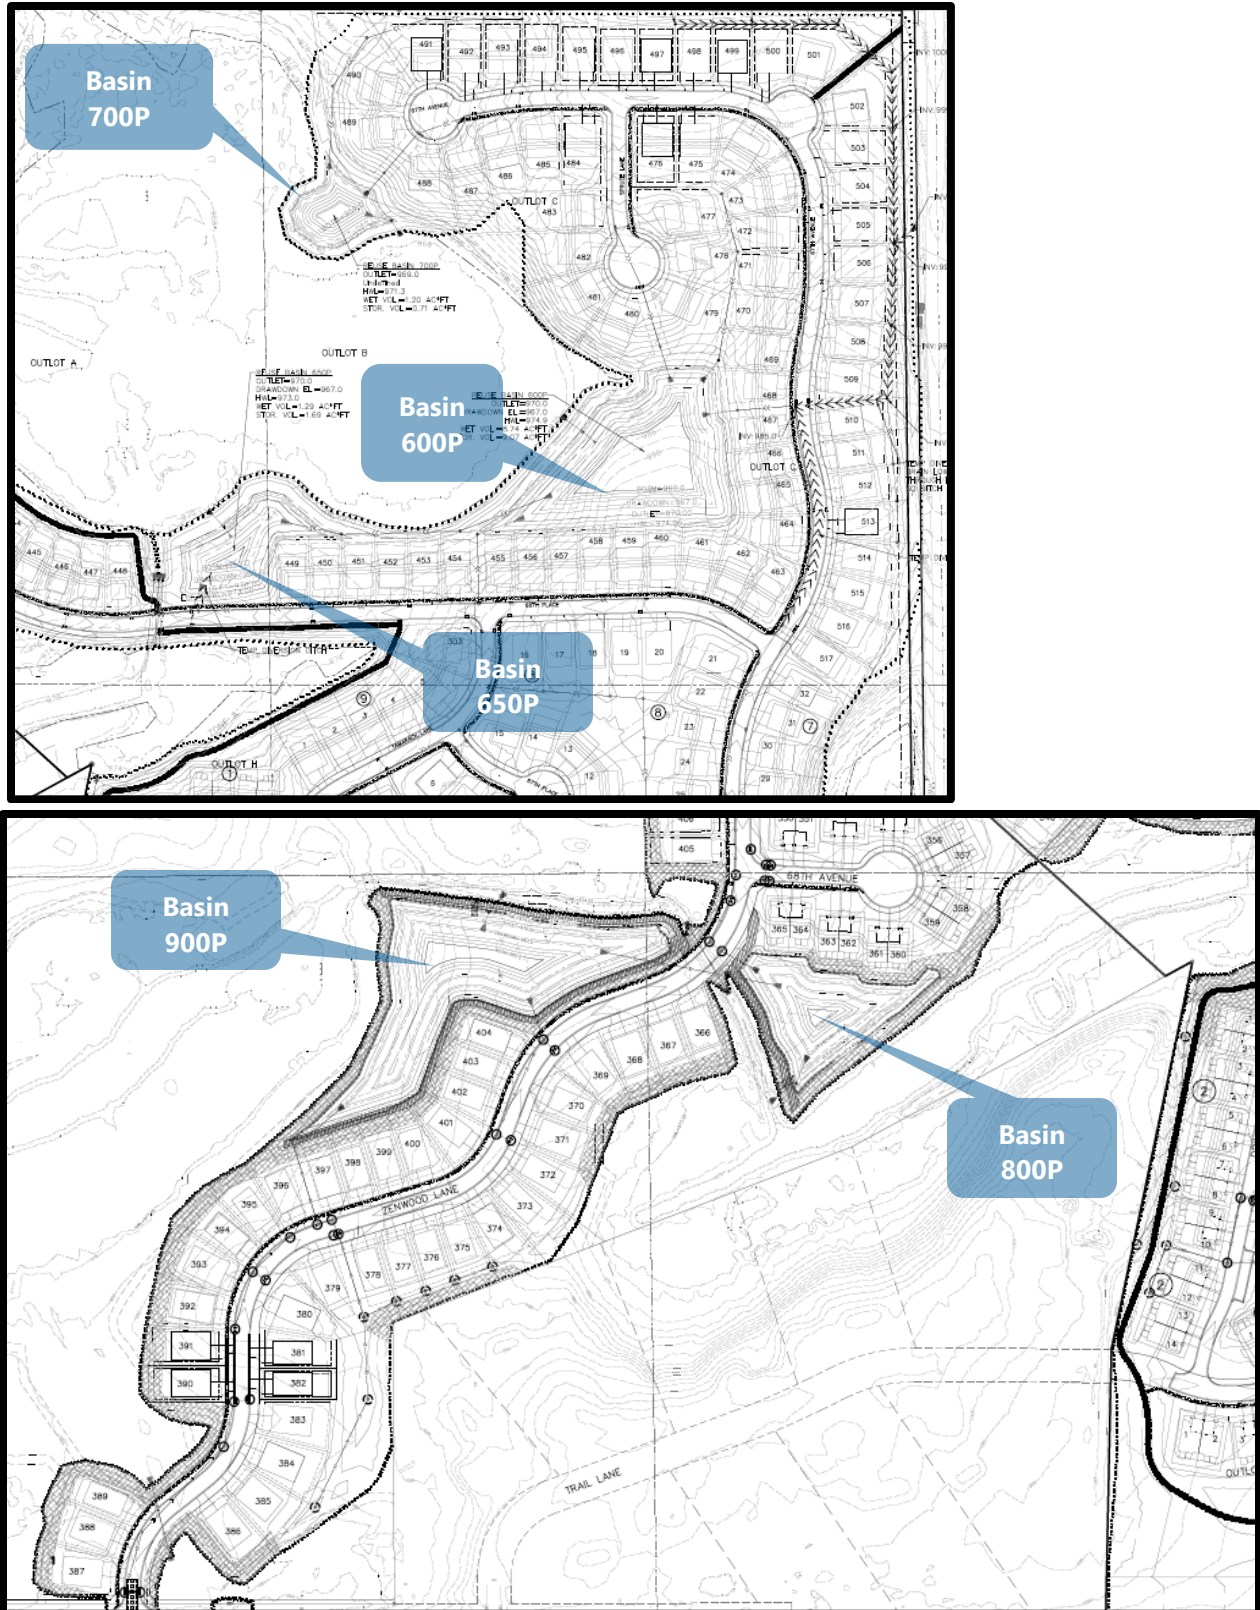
Phase 2 Grading Plan – Stormwater Basins
